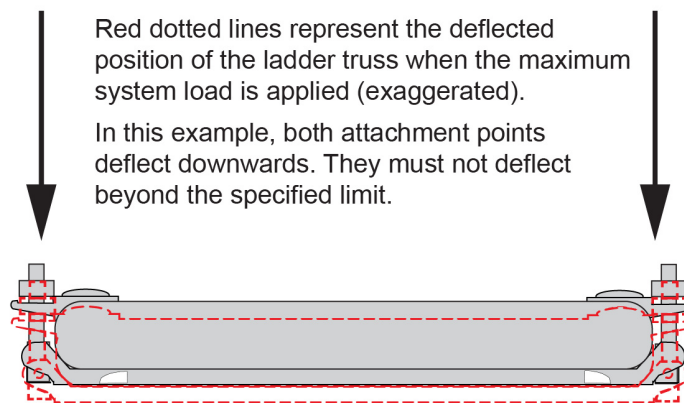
Allowable Truss Tube Attachment Deflection on a Ladder Truss
